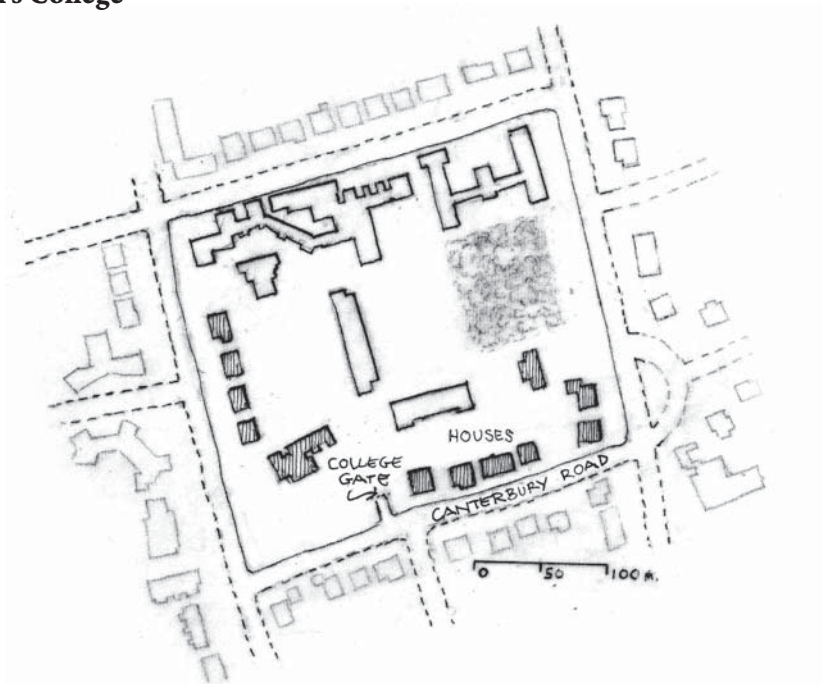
Plan of the rectangular urban block owned by St Hugh's College showing new college buildings and existing houses . Ill.6a as Ill.6 with captions (drawing by I. Samuels)
